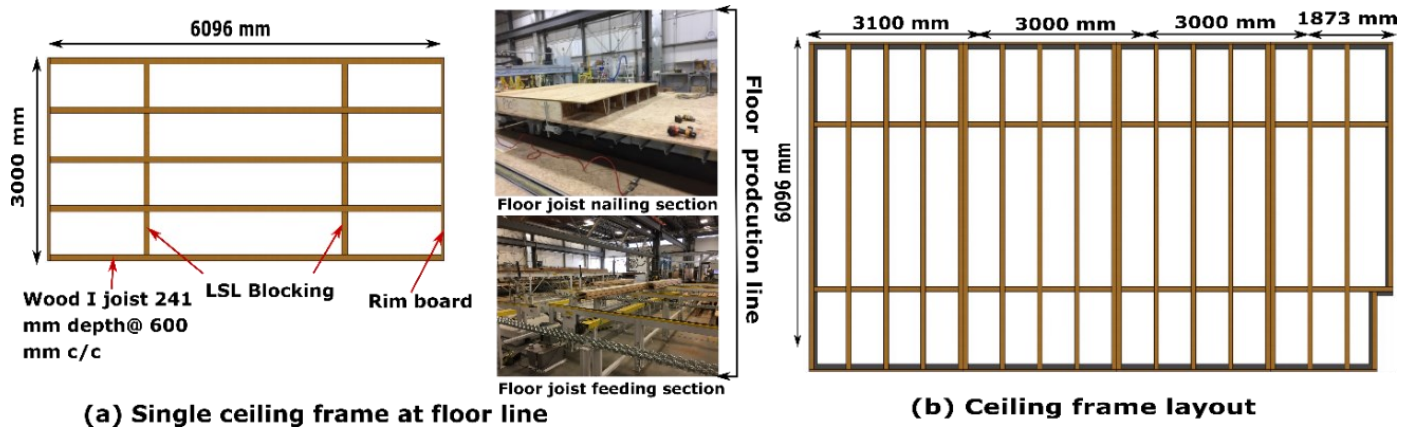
a) Ceiling Frame Fabrication using wood I-Joist b) Ceiling frame layout of the case study
